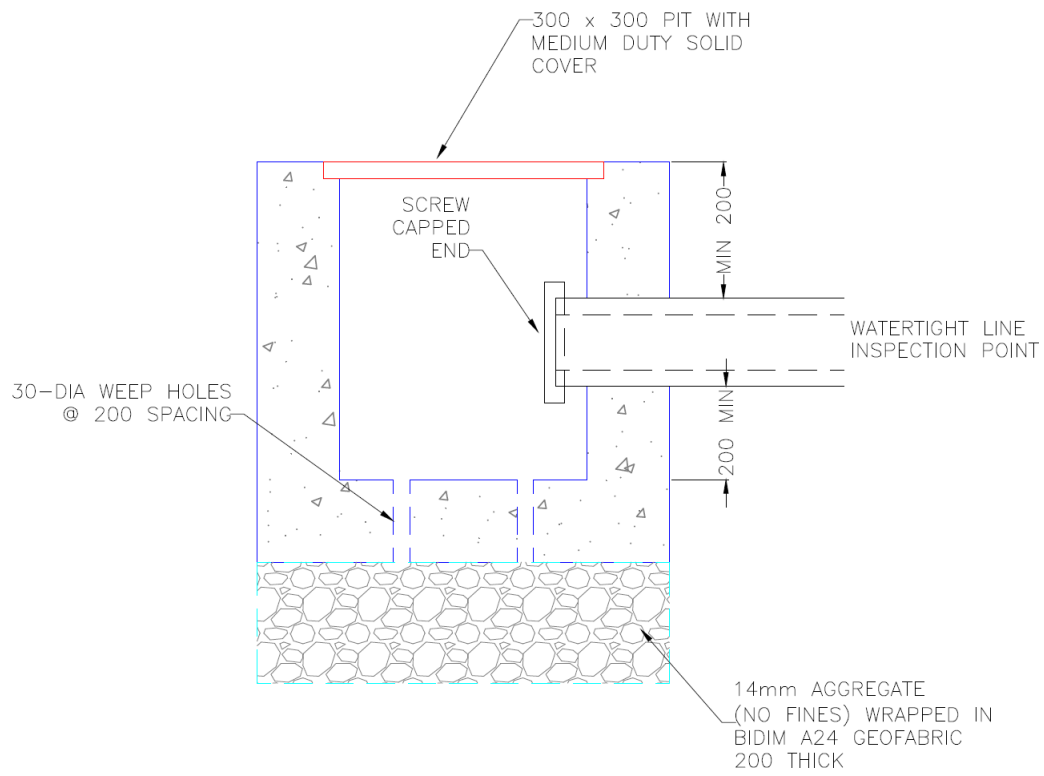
TYPICAL ‘CLEAN-OUT’ PIT DETAIL
